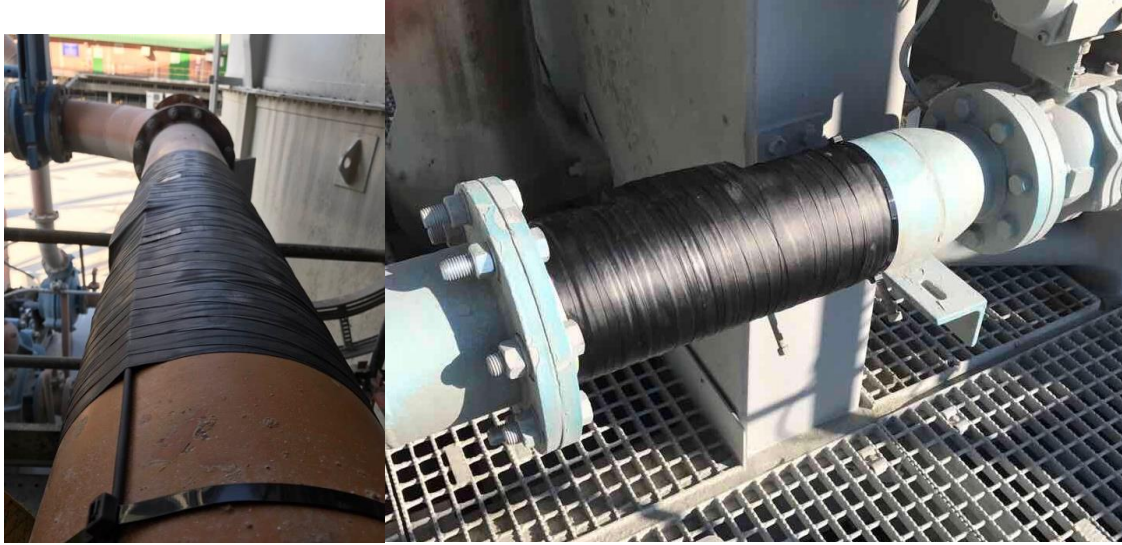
Detailed views of zone 3 and zone 4 following installation. (Left) Slurry slump flow and (right) air feed.
